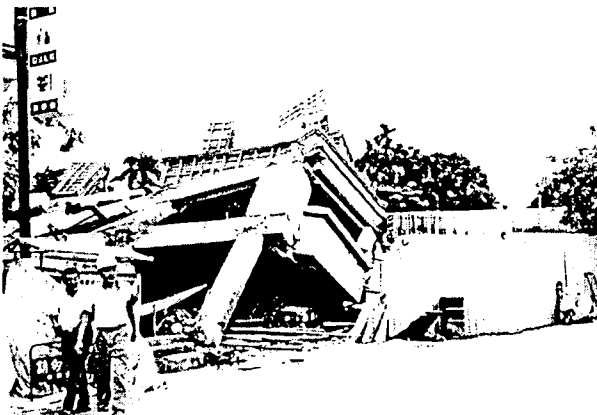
Building damage under construction (Chich Twon, Nantou County)
